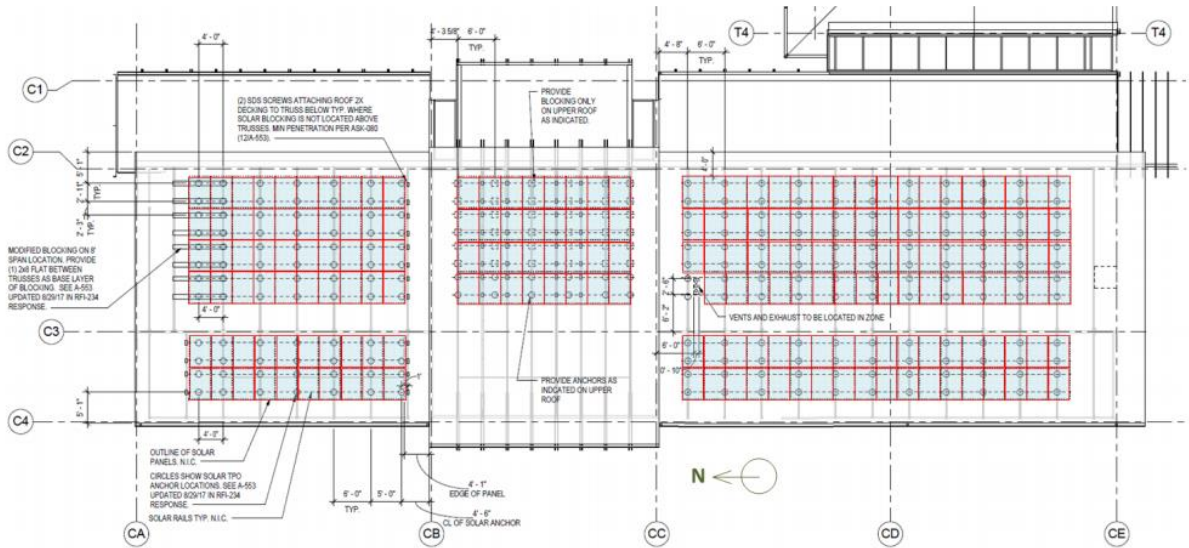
Sample site plan, PV panel configuration implemented on roof structure
